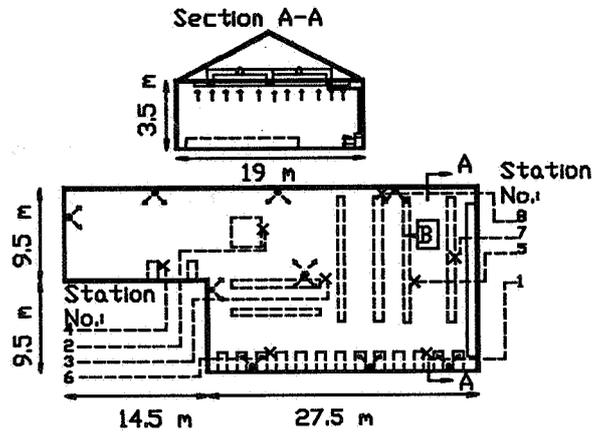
Layout and cross-section of the plant designed for DISPVENT (not to scale)
